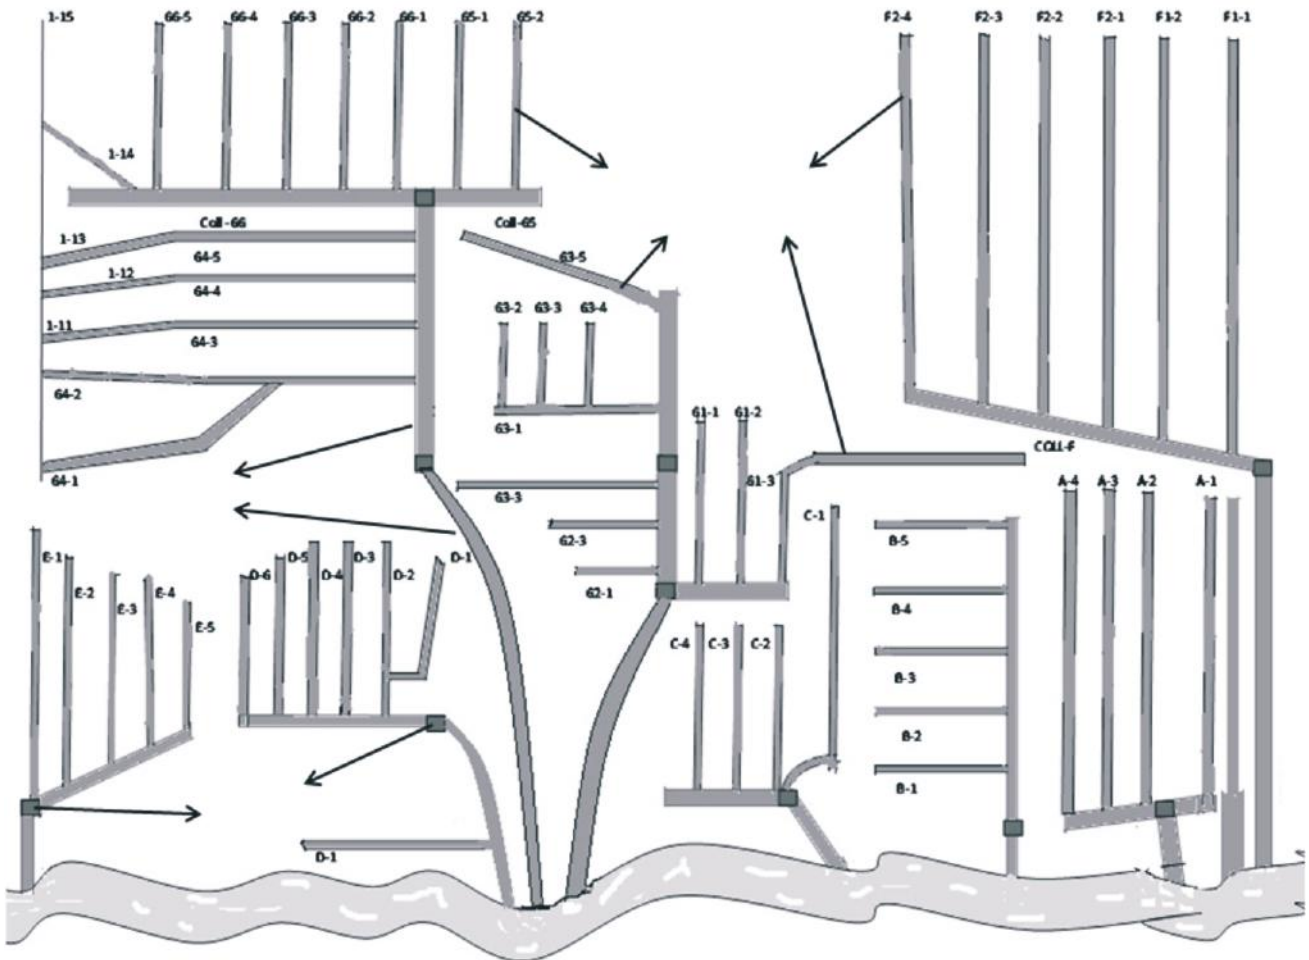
Sub surface drainage layout (area : 136 acres) at Thyavanige village of Davanagere district
